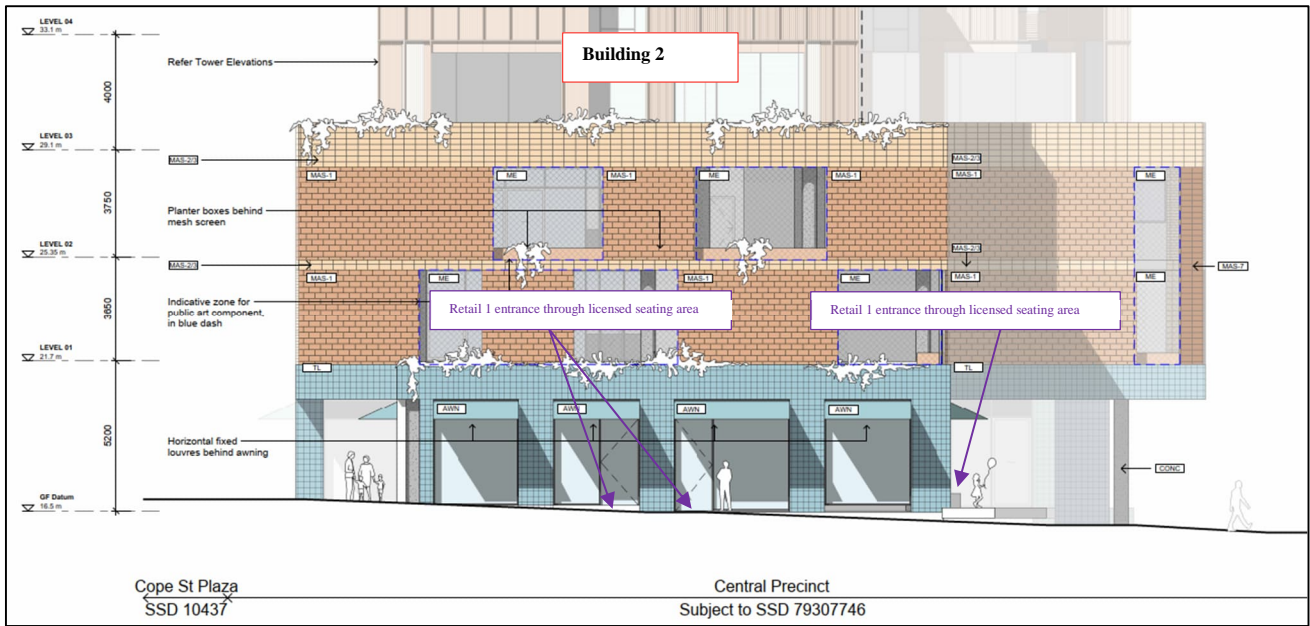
Central Precinct external elevation – north view (from Grit Lane)
